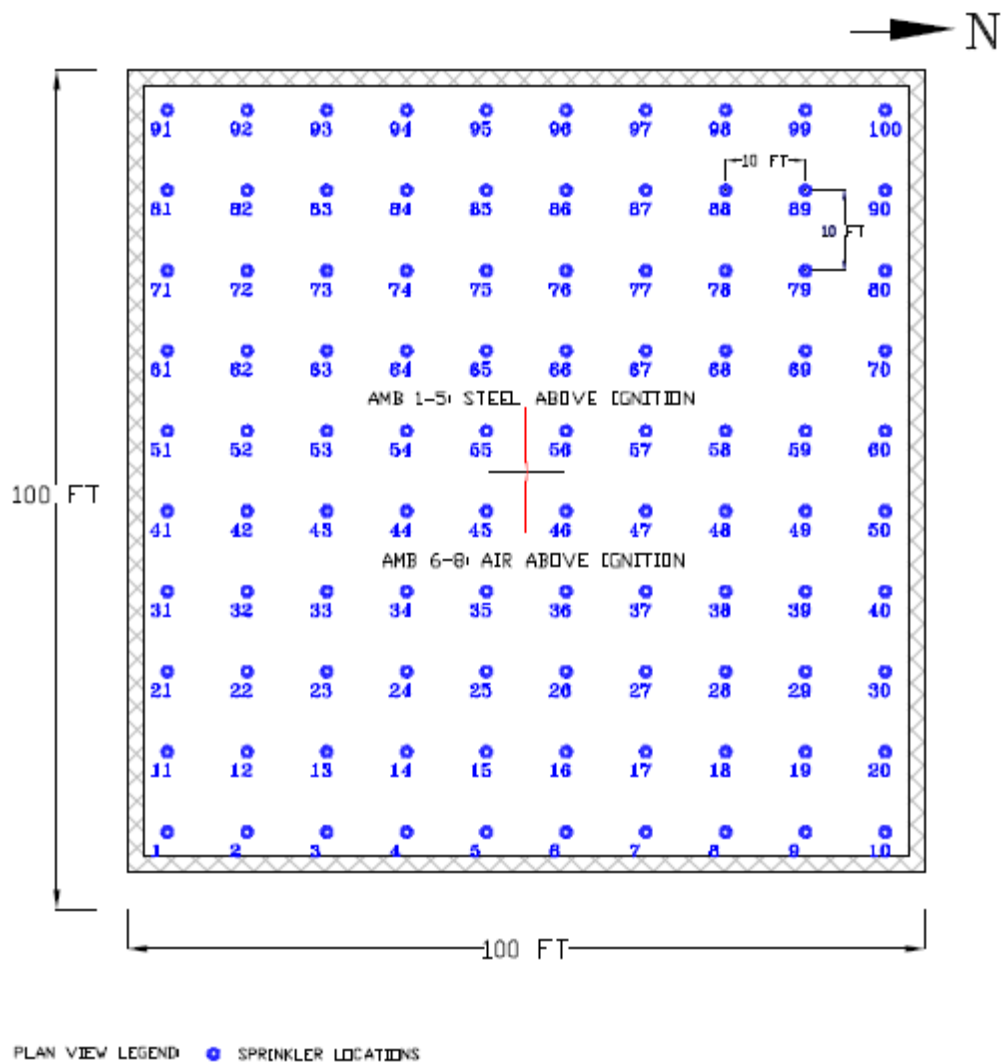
Schematic of the plan view of the high-rack storage section test for sprinkler and instrumentation location (SEC, 2009)
